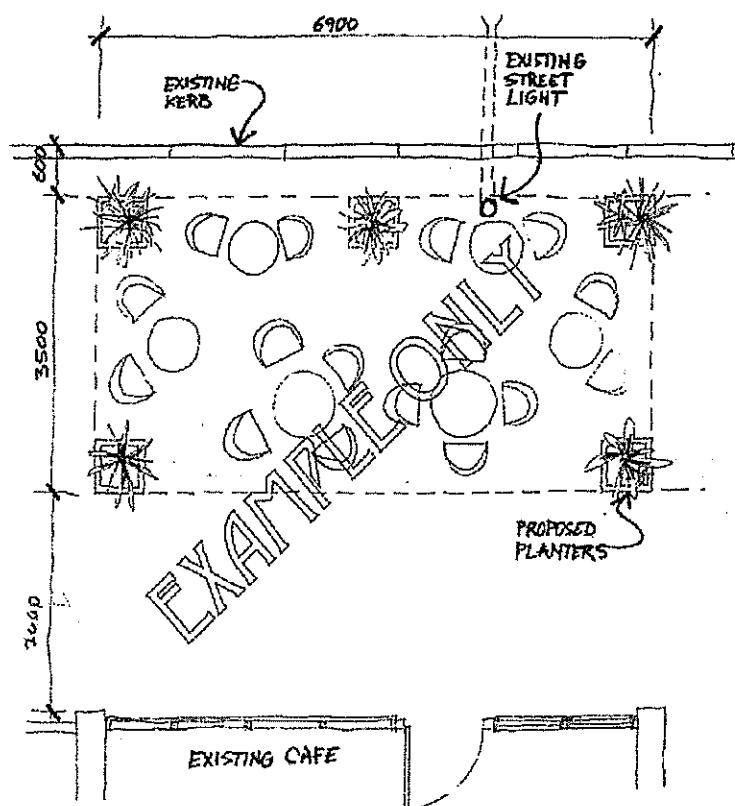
Typical Plan of Proposed Alfresco Dining Area.
